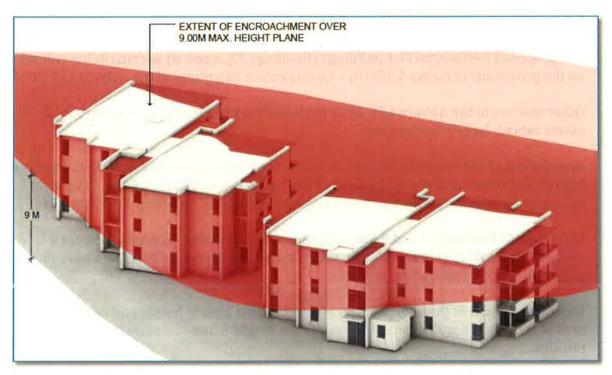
Building height plan section through Buildings A and B – new position of buildings
